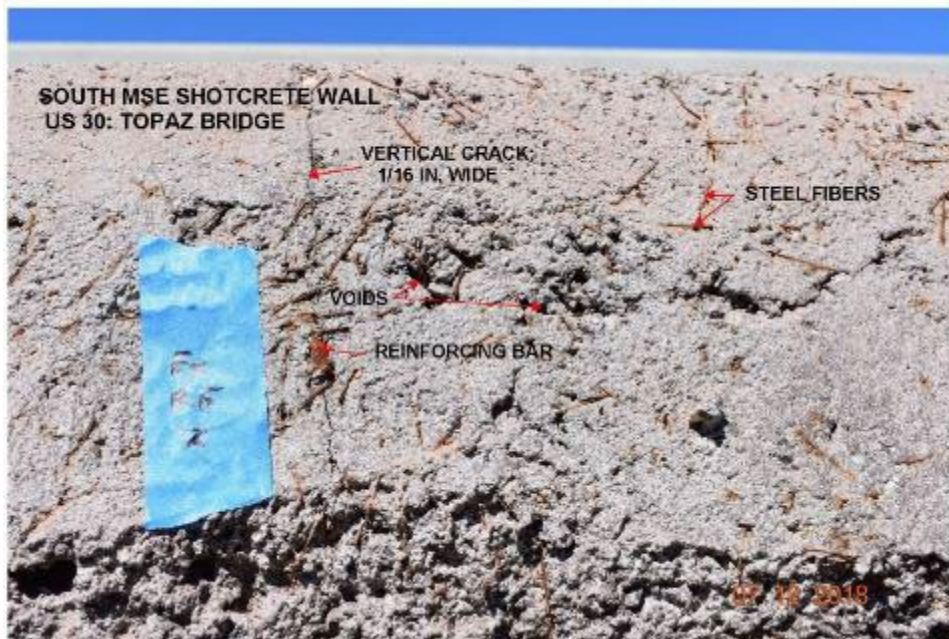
Vertical Cracks and Small Voids in Fiber-reinforced Shotcrete at Topaz Bridge
